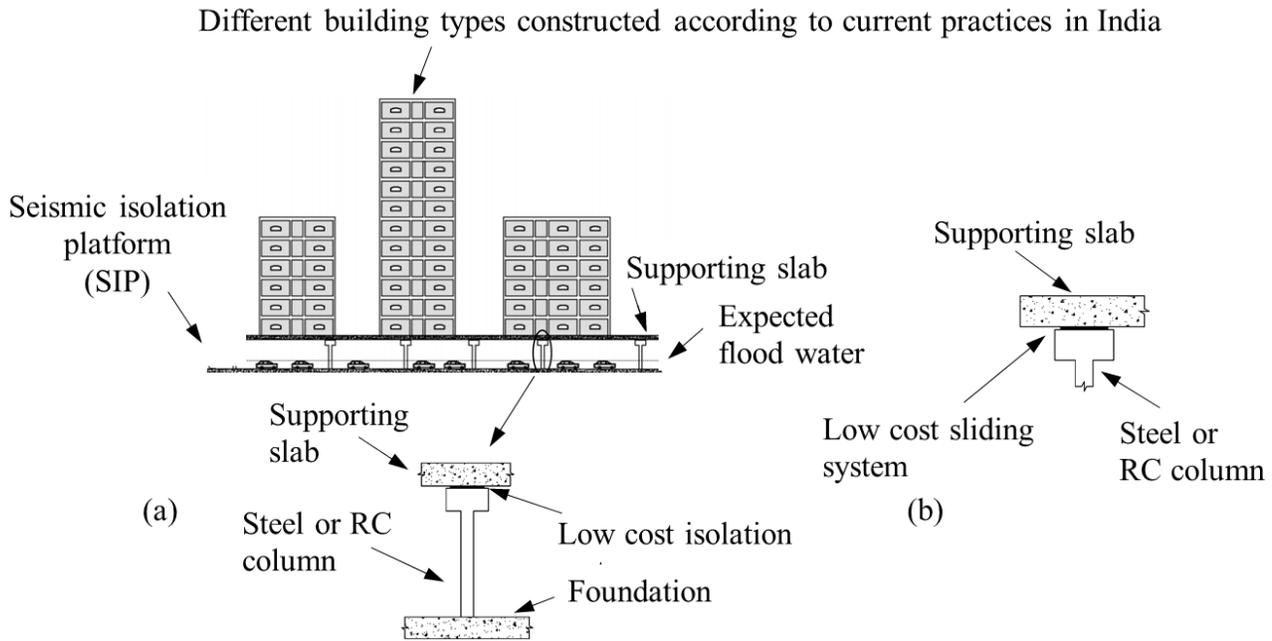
Resilient Seismic isolation platform (SIP) concept built to support buildings: (a) overview, (b) alternative low-cost isolation systems
